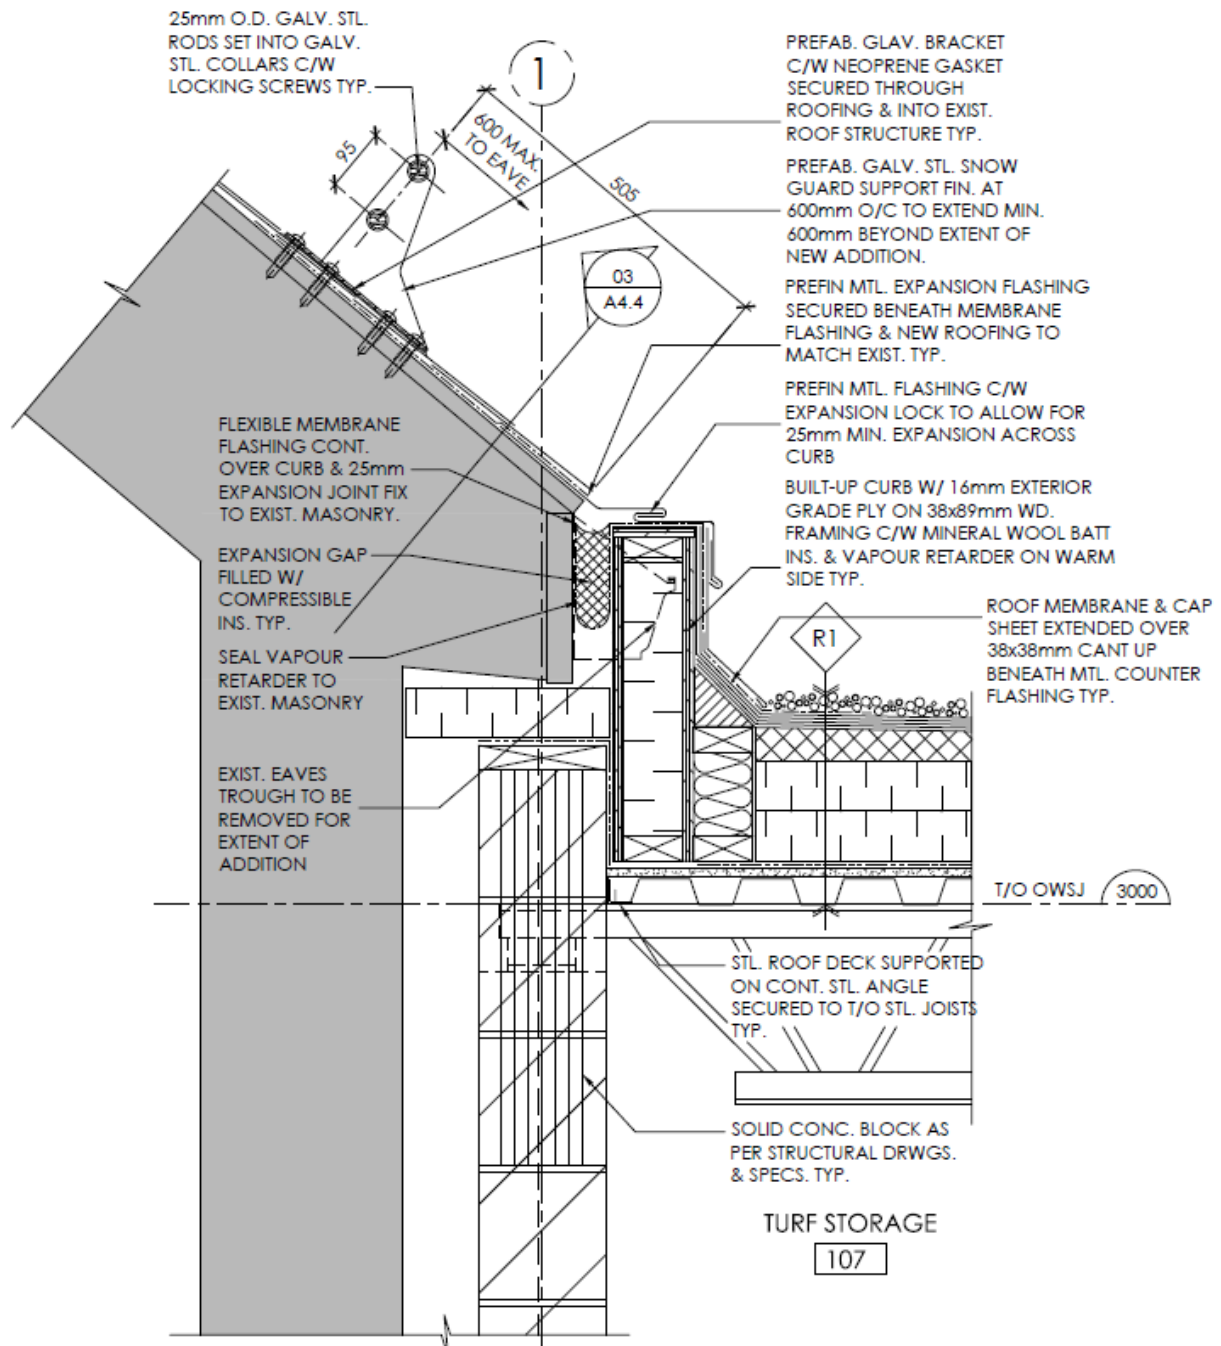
Detail Section at new flat roof and heritage sloped roof fascia. Source: +VG Architects
